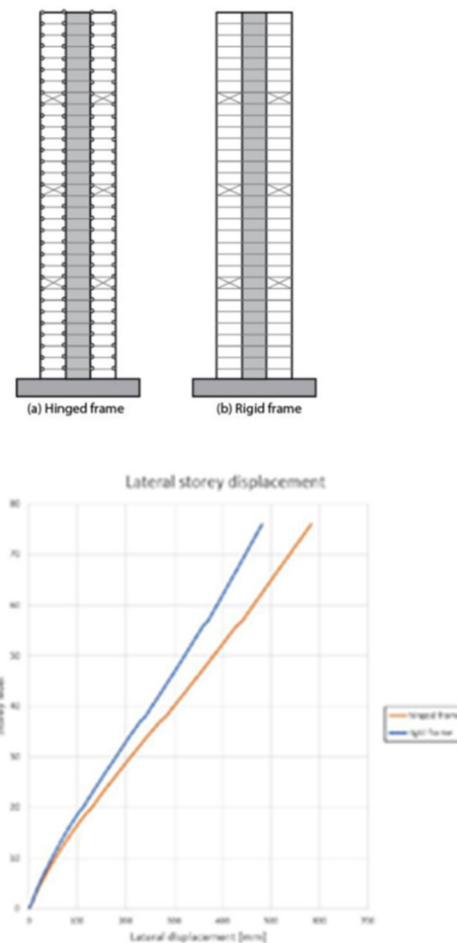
Influence of the use of moment resisting or hinged connections for column to column and column to beams.
